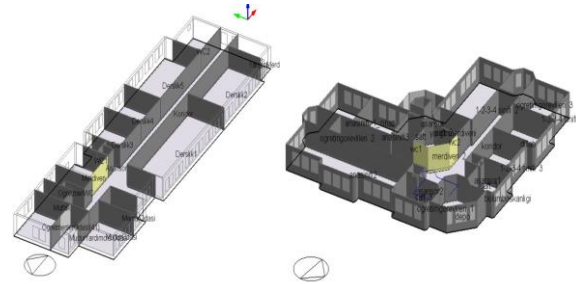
Building Modelings in DesignBuilder (Building Type A on the left and Building Type B presented on the right)
